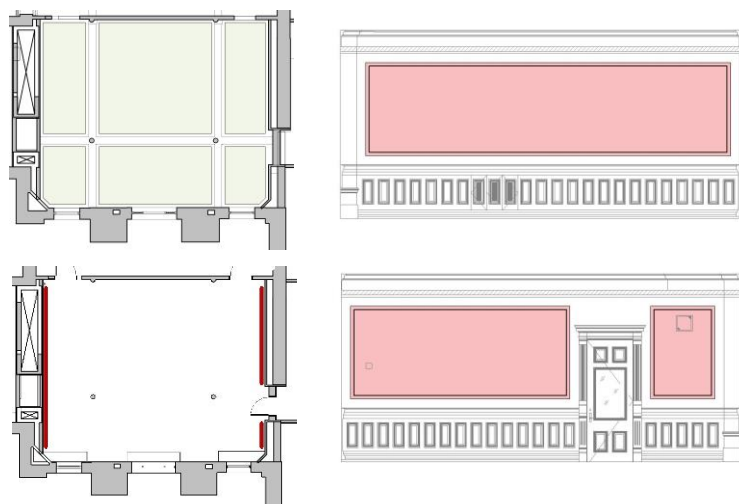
c - Ceremonial Conference Room Floor Plans, Reflected Ceiling Plans, and Elevations
